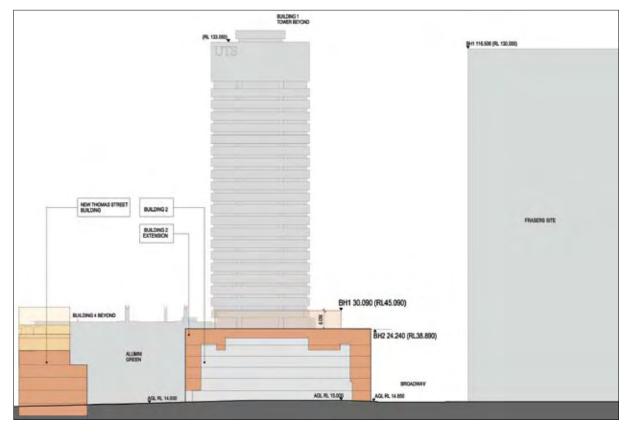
Elevation - eastern side of Jones Street (Source: BVN)
